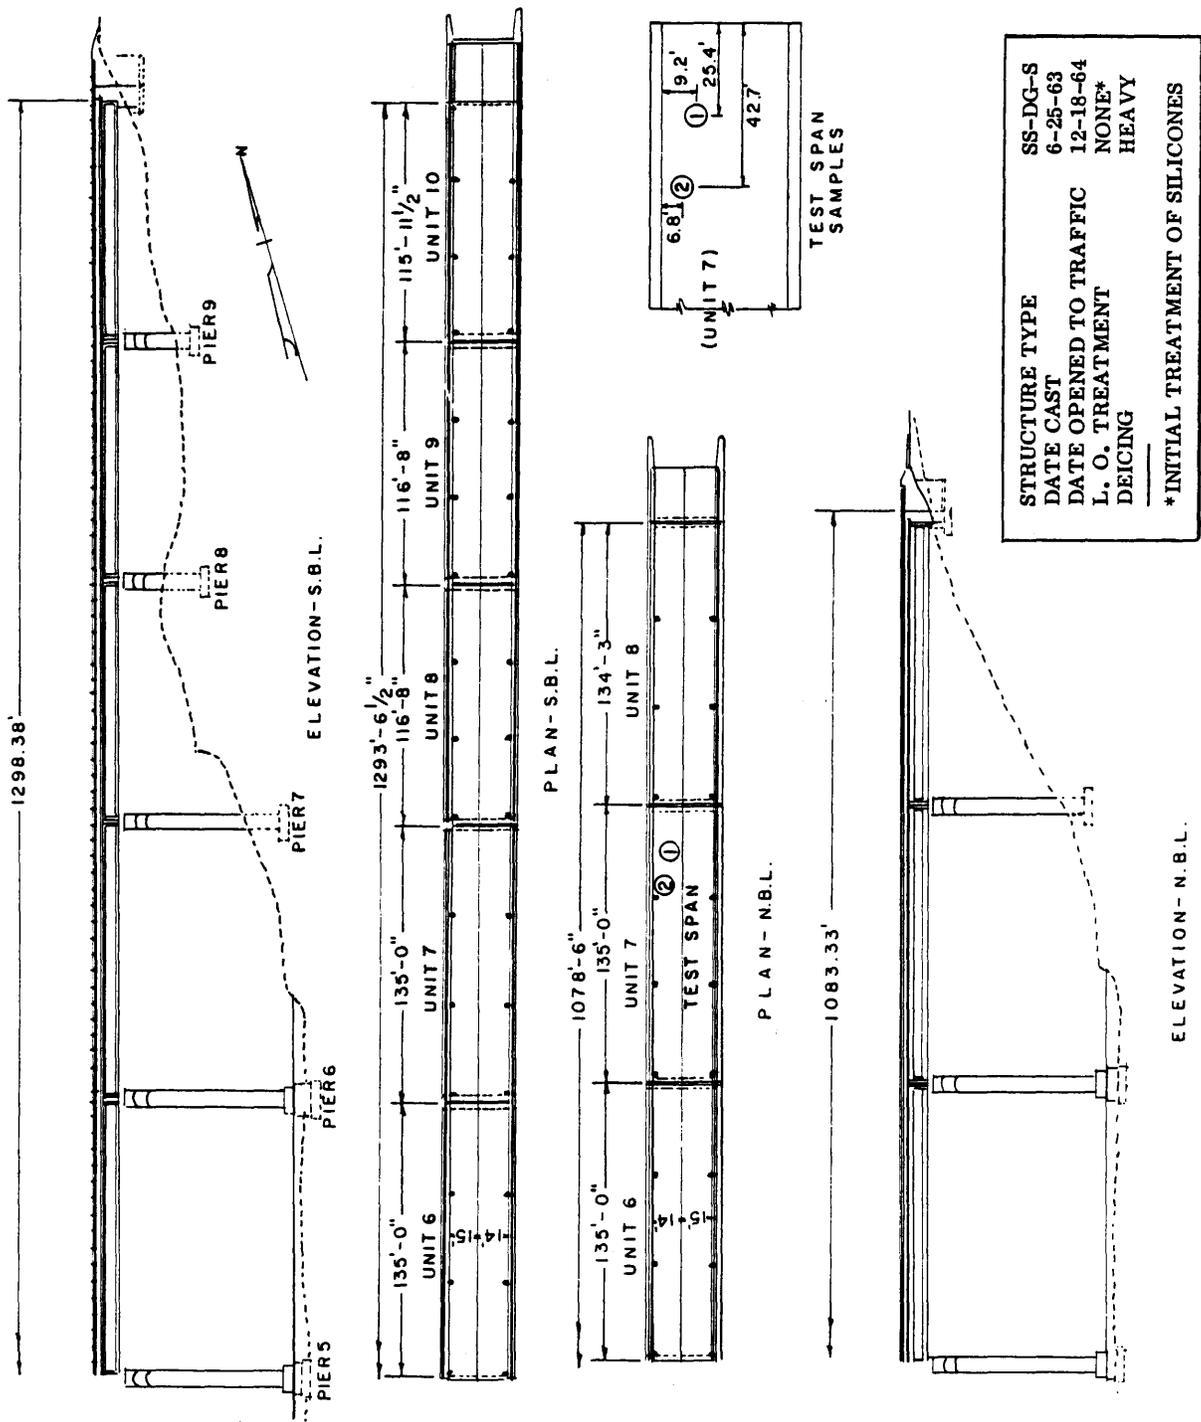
(a). Plan for bridge #7 (southern section); also shown are the locations of test samples.
